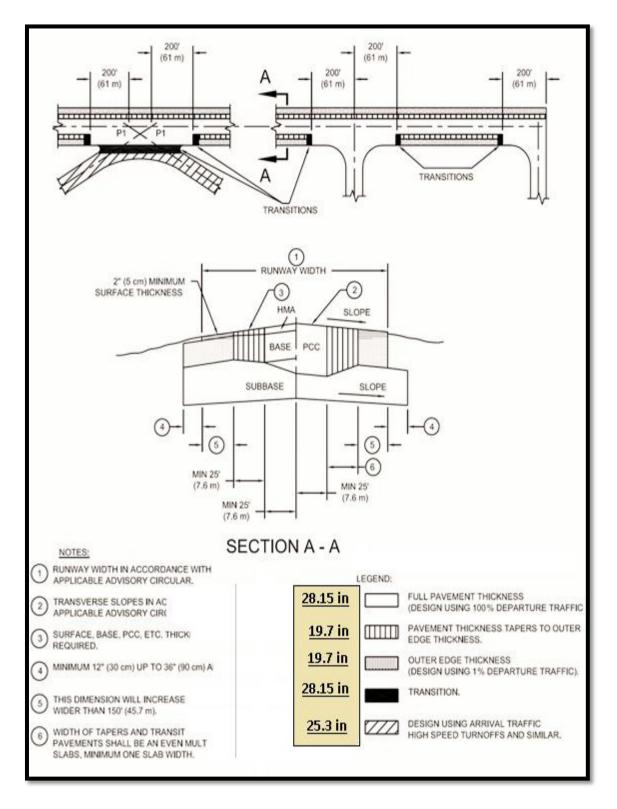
Typical Plan and Cross Section for KNIA Runway Pavement designed by FAARFIELD program
